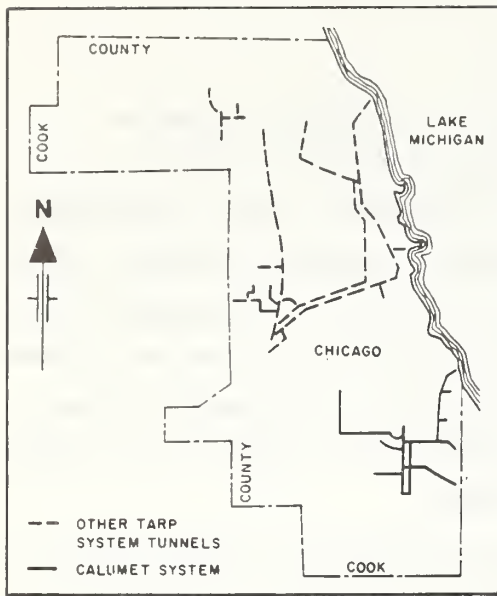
PLAN VIEW OF THE CALUMET SYSTEM OF THE TUNNEL AND RESERVOIR PLAN, CHICAGO, ILLINOIS
